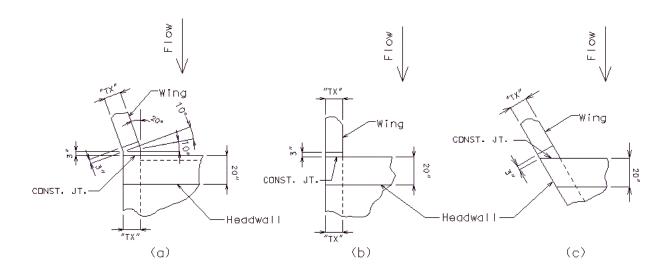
Partial details of wing wall (a) flared wing wall (b) straight wing wall with zero skewed angle (c) straight wing wall with skewed angle
